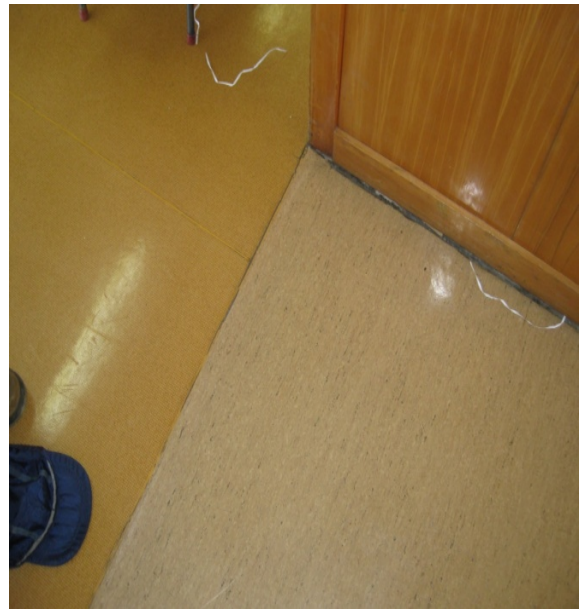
Zoomed out view where the cracks along the corridor shown in Photo 9 were found.
